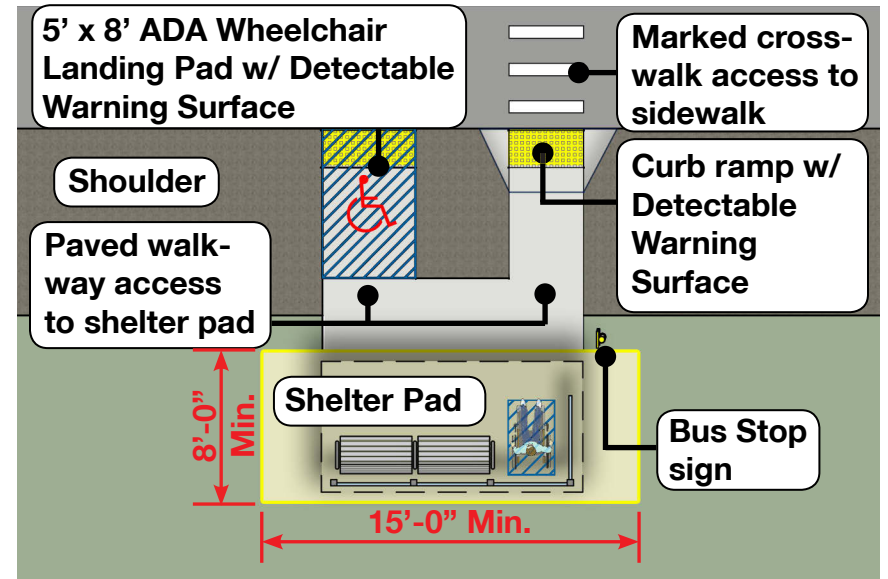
Accessory pad at road with shoulder, sidewalk on opposite side
